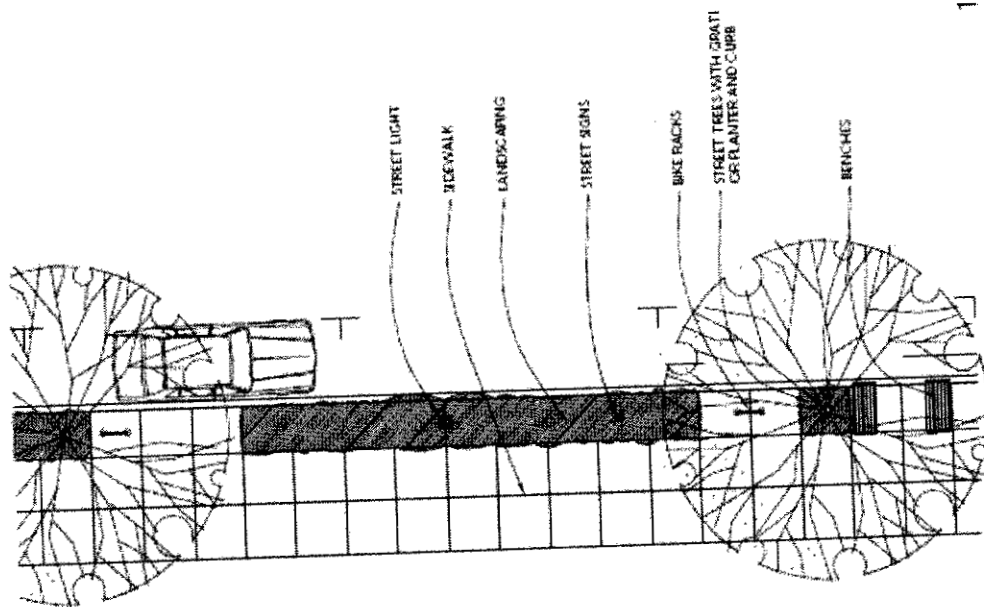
PLANTING POCKETS ALONG ROADWAYS
